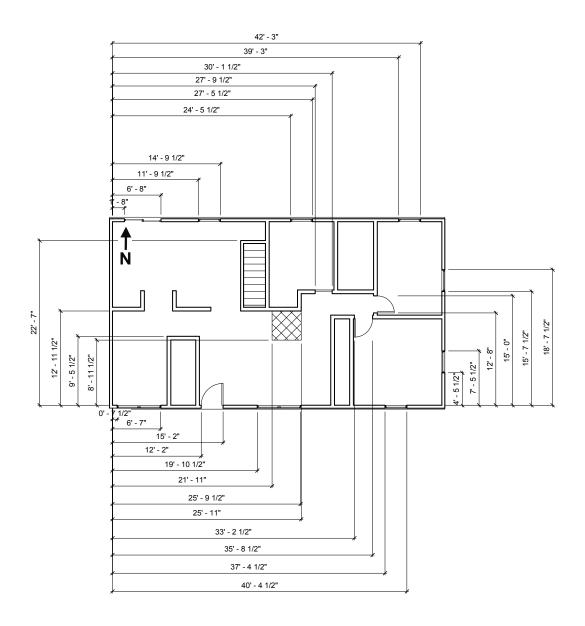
Fully Dimensioned Floor Plan of the First Floor Vent Locations
